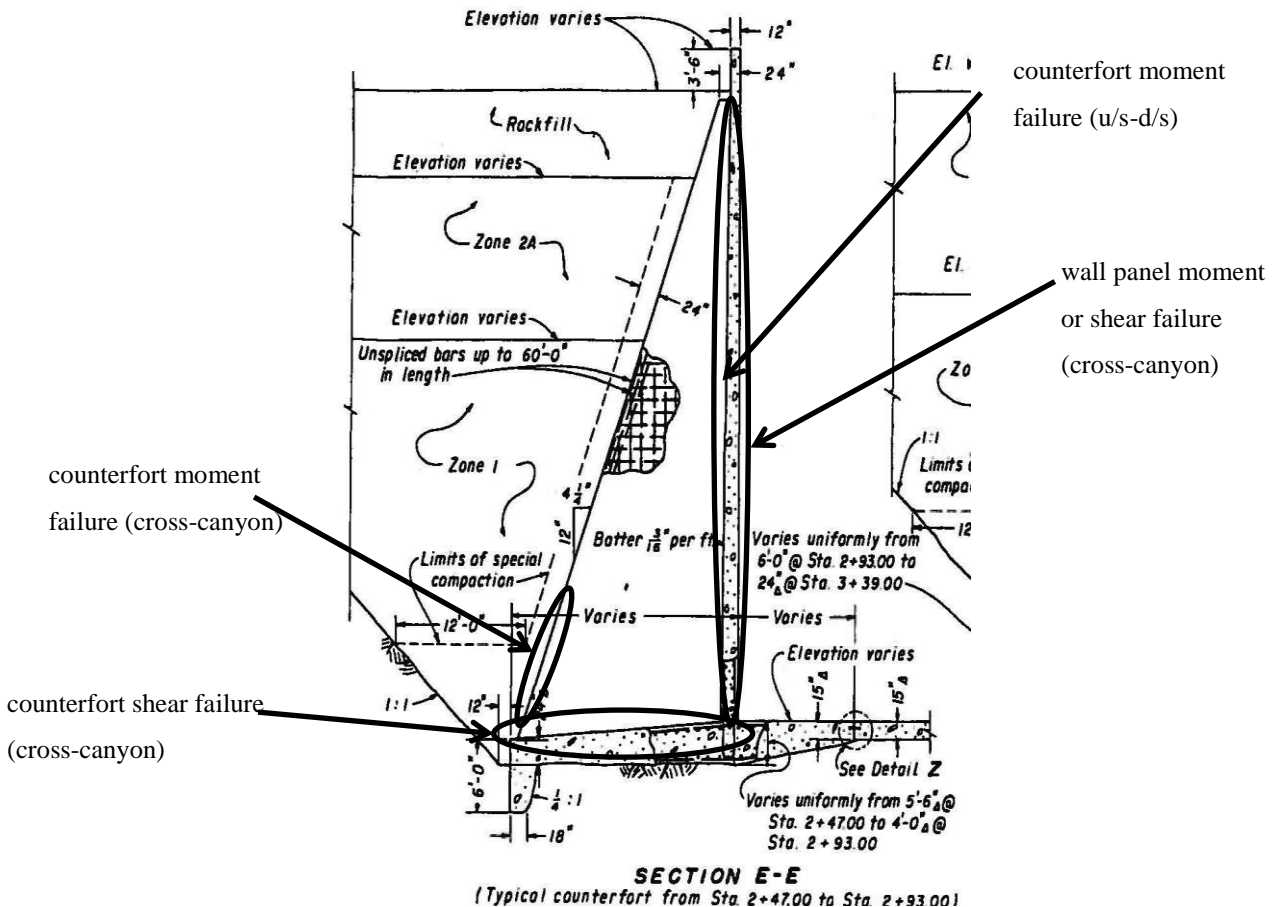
Failure Mechanisms for Counterforted Walls
